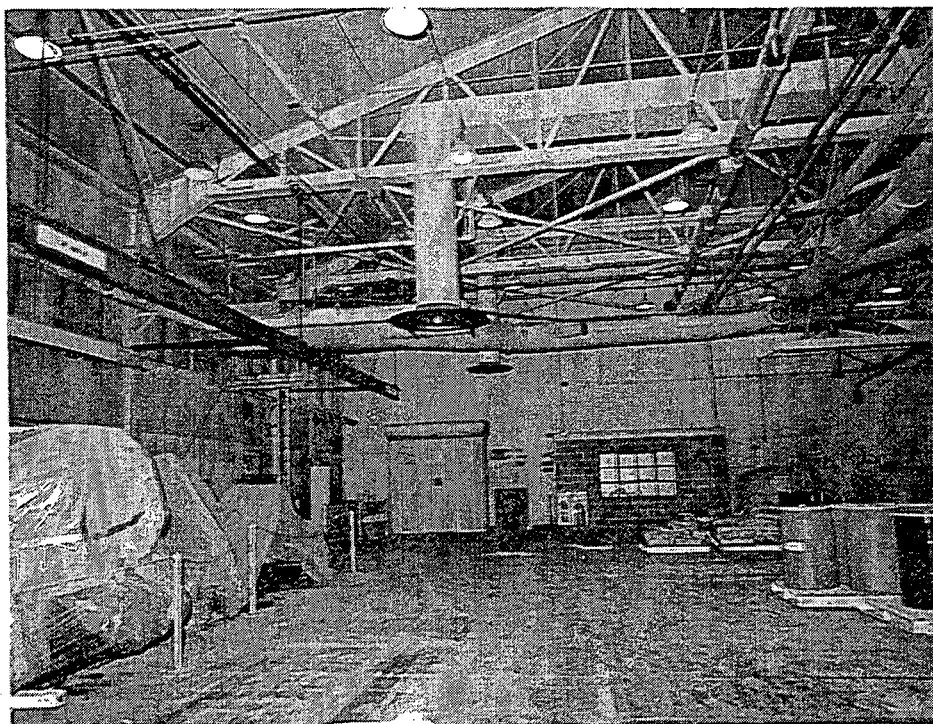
Building 9A - Uranium Machining Area, Facing South
